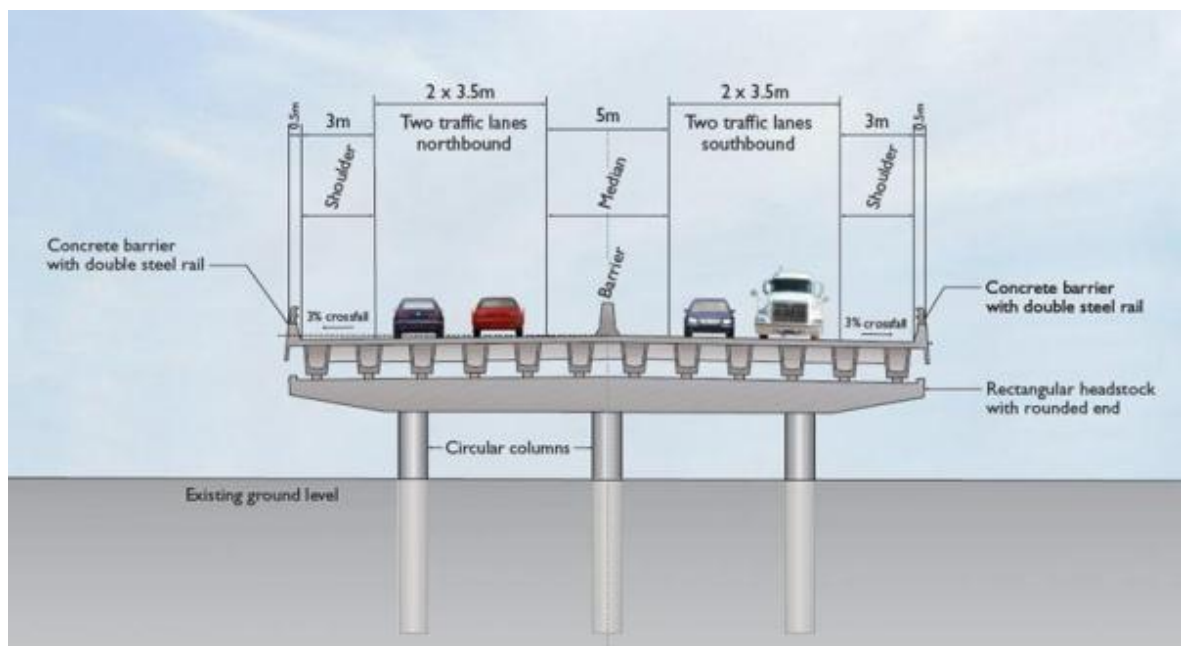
Indicative cross sections through Berry Bridge and Wharf Road Underbridge
